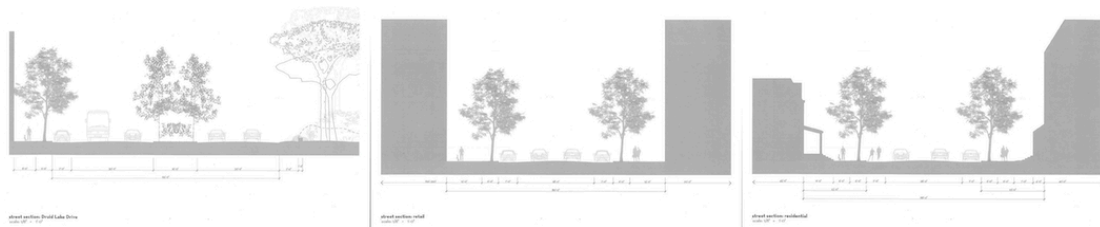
Proposal: Druid Hill Park: section: park drive, retail and residential
